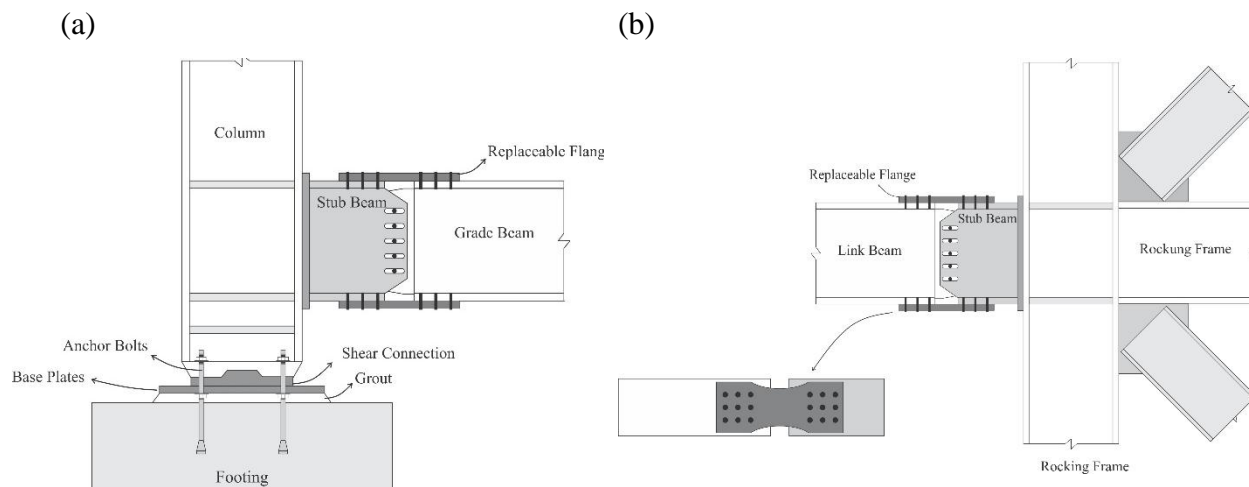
a) Fuse connection in Grade Beam – b) Fuse connection in Link Beam
